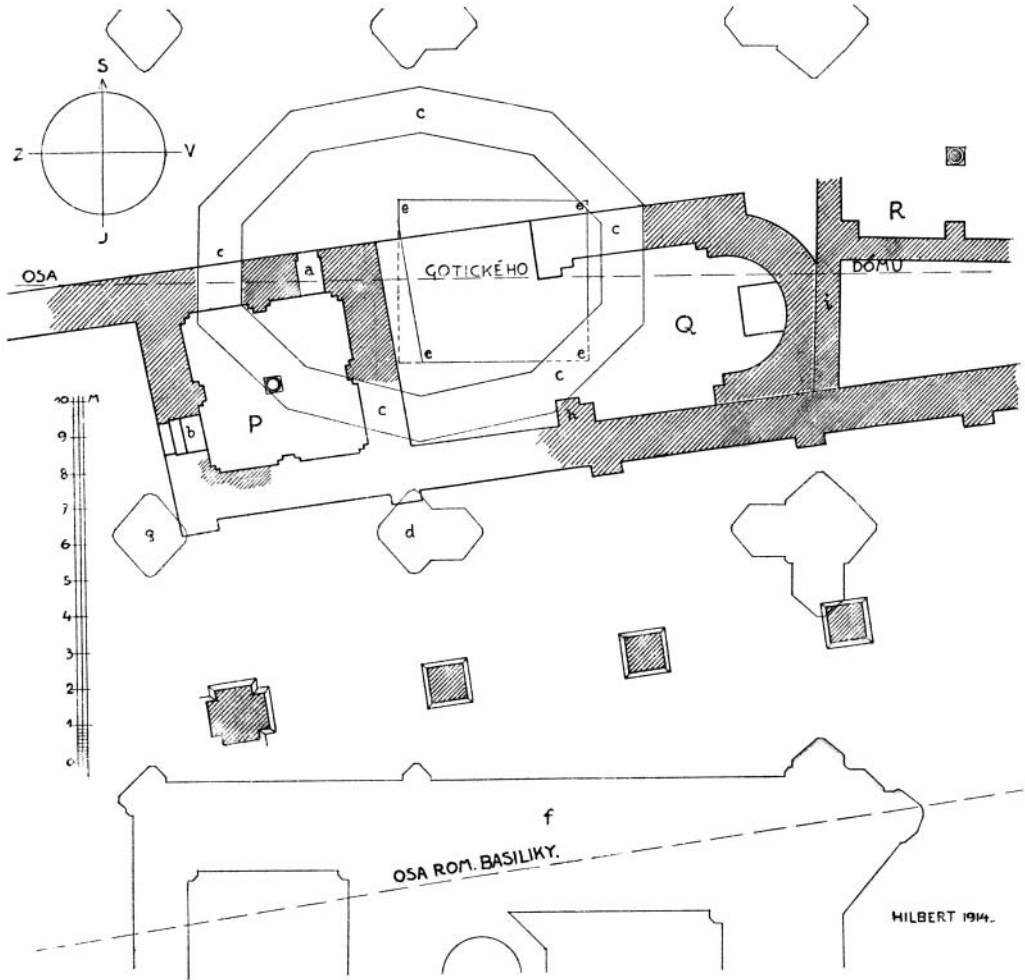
Prague, St Vitus's Cathedral: ground plan of Romanesque north tower and grave of St Adalbert
